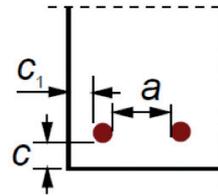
Values for straight bars in beams and slabs (EN 1992-1-1) Note:  $c_d = \min(a/2, c_1, c)$
